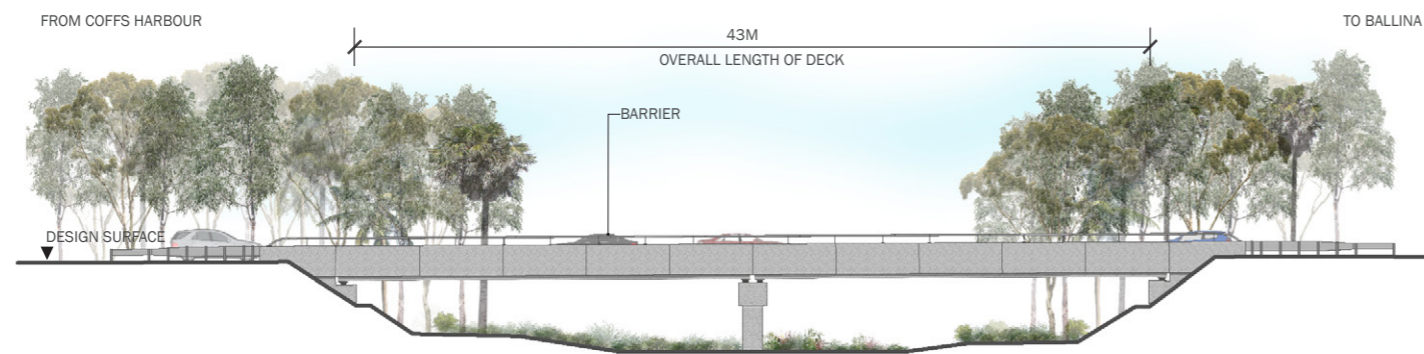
Floodway bridge (Wardell Bridge) - elevation (Scale 1:400)
